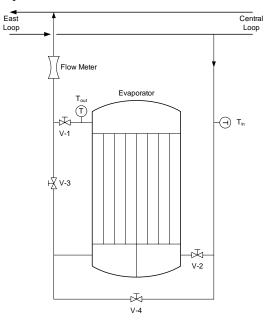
Schemetic Layout of Evaporator and Piping Configuration
